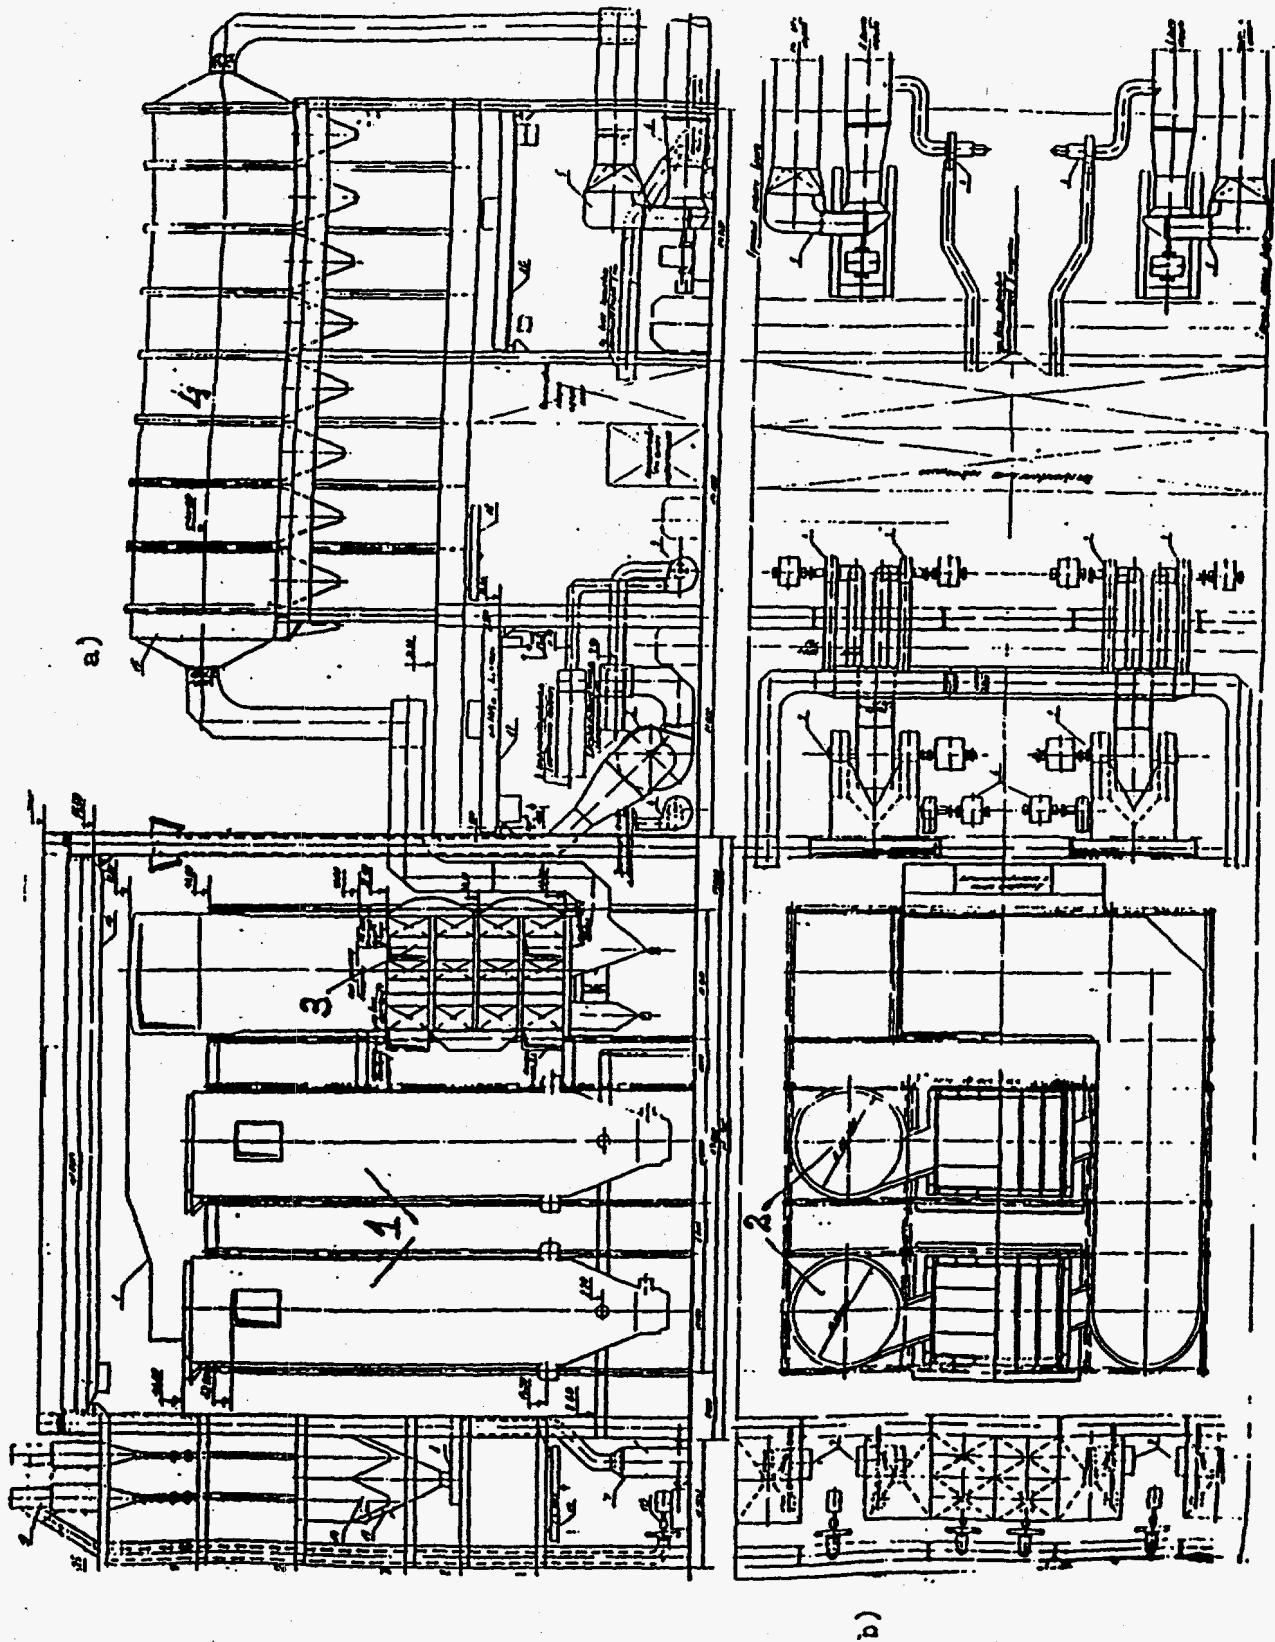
CFB boiler installation: a) cross-section, b) layout
